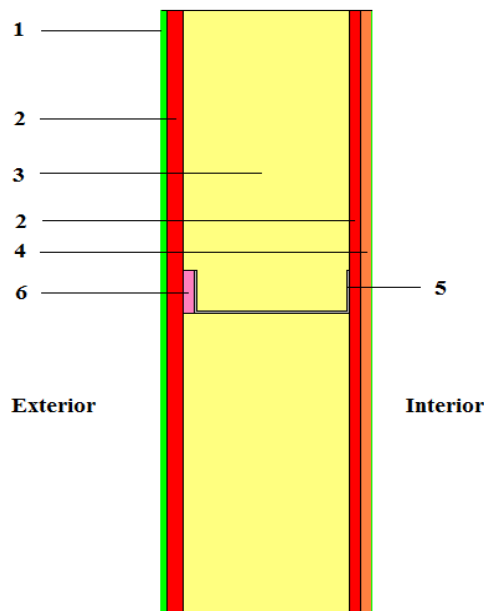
The scheme of a fragment of the steel framed wall with thermal breaks. Materials: 1 – exterior plaster; 2 – oriented strand board (OSB); 3 – thermal insulation; 4 – interior plaster board; 5 – steel stud; 6 – thermal insulation strip
